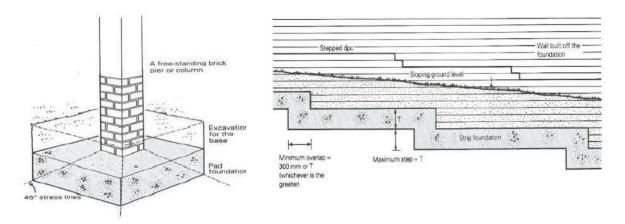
Pad Foundation Figure 8.6 Stepped Foundation
